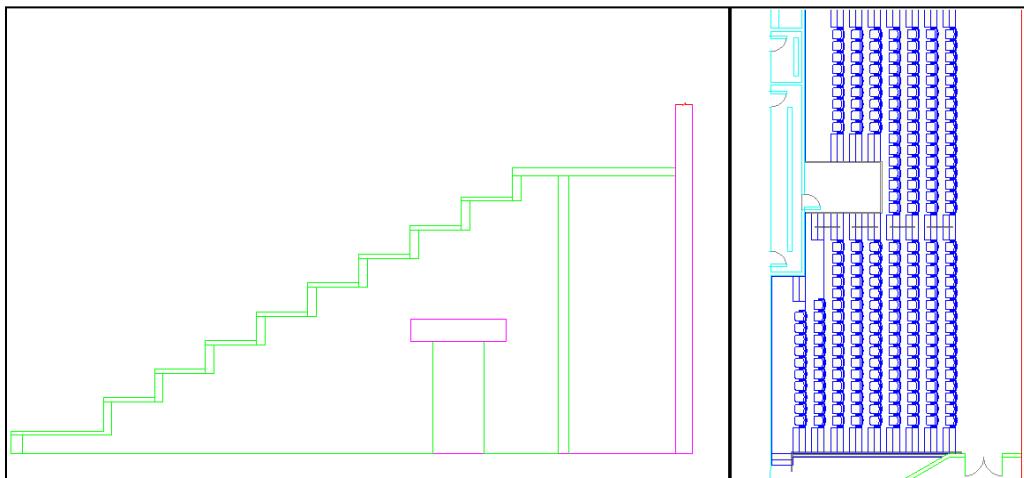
Bleachers Layout, Partial (Right), and Cross Section (Left)
